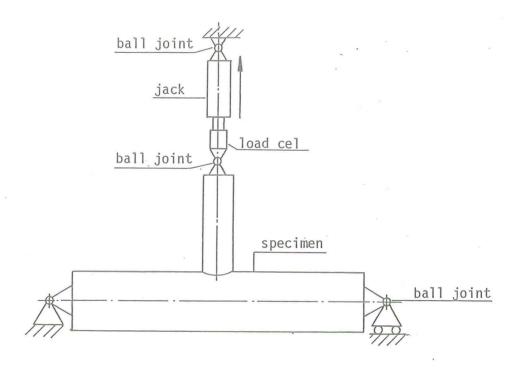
Test rig for Ø168.3 mm tubular T-joints (in plane bending) (used for specimen 24 25 26)
